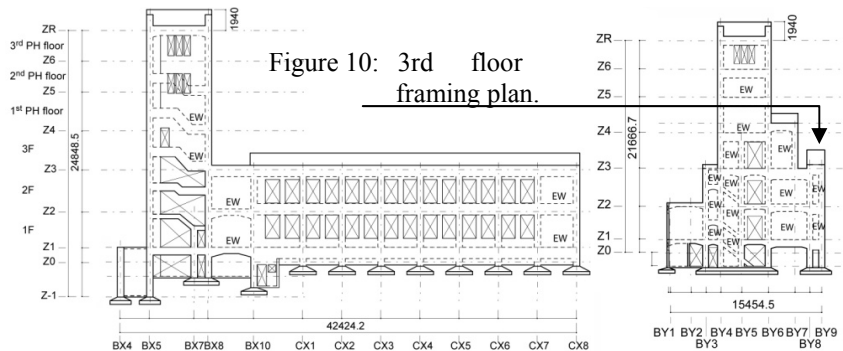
BY4-CY1 framing elevation. Figure 9: BX5 framing elevation.
